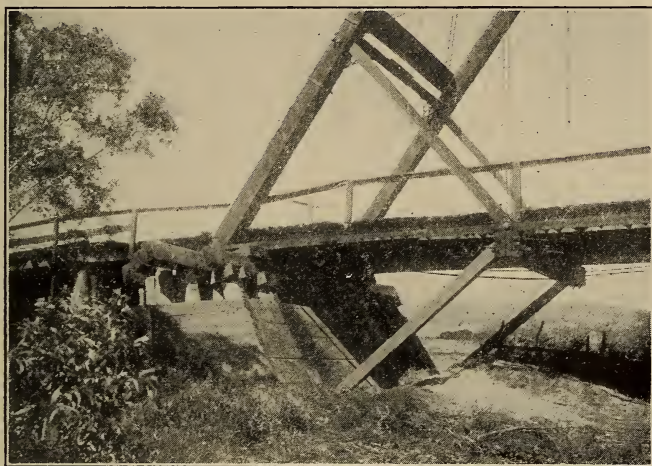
South Abutment, Salinas Highway Bridge.
